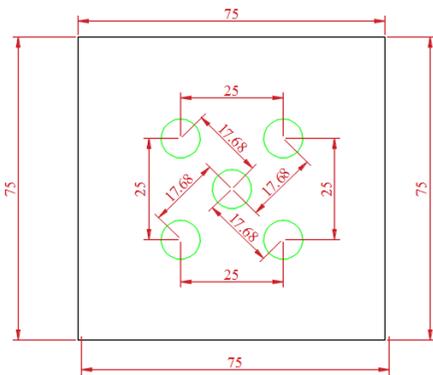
Schematic Plan for Soil-Cement Column arrangements.
